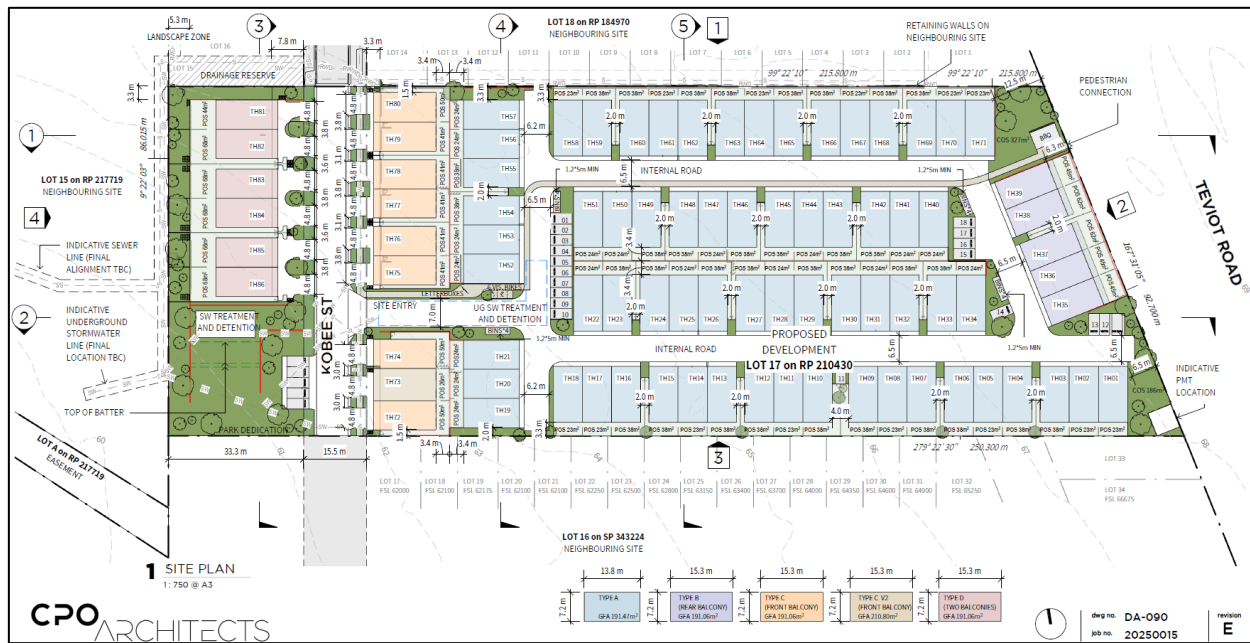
Proposed Plans (source: CPO Architects, DA-090, 20250015 Rev E.)
